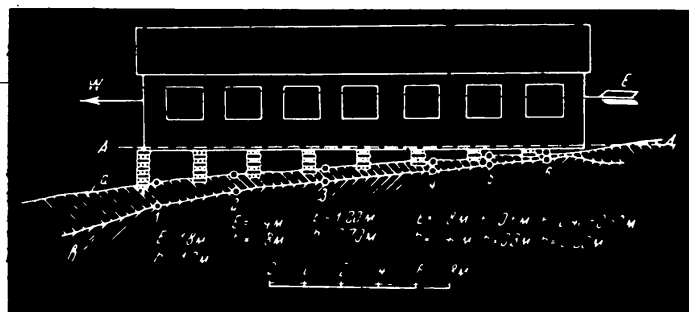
One-story Building, 22.3x3.3 ft. in plan, Erected on Sloping Site in 1932. Position of the Permafrost Upper Limit as of 4 Sep 1947
